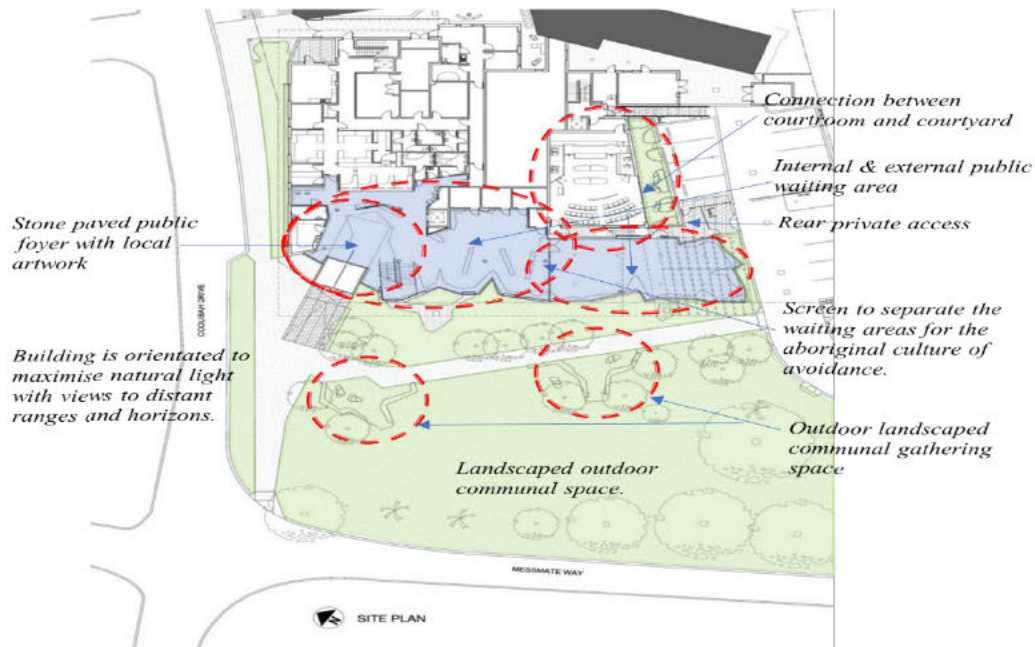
Site Plan/Ground Floor Plan of the Kununurra Courthouse Complex
